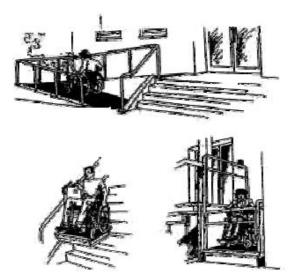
Building entrances with platform lifts and stairs (ASI, 2001)
